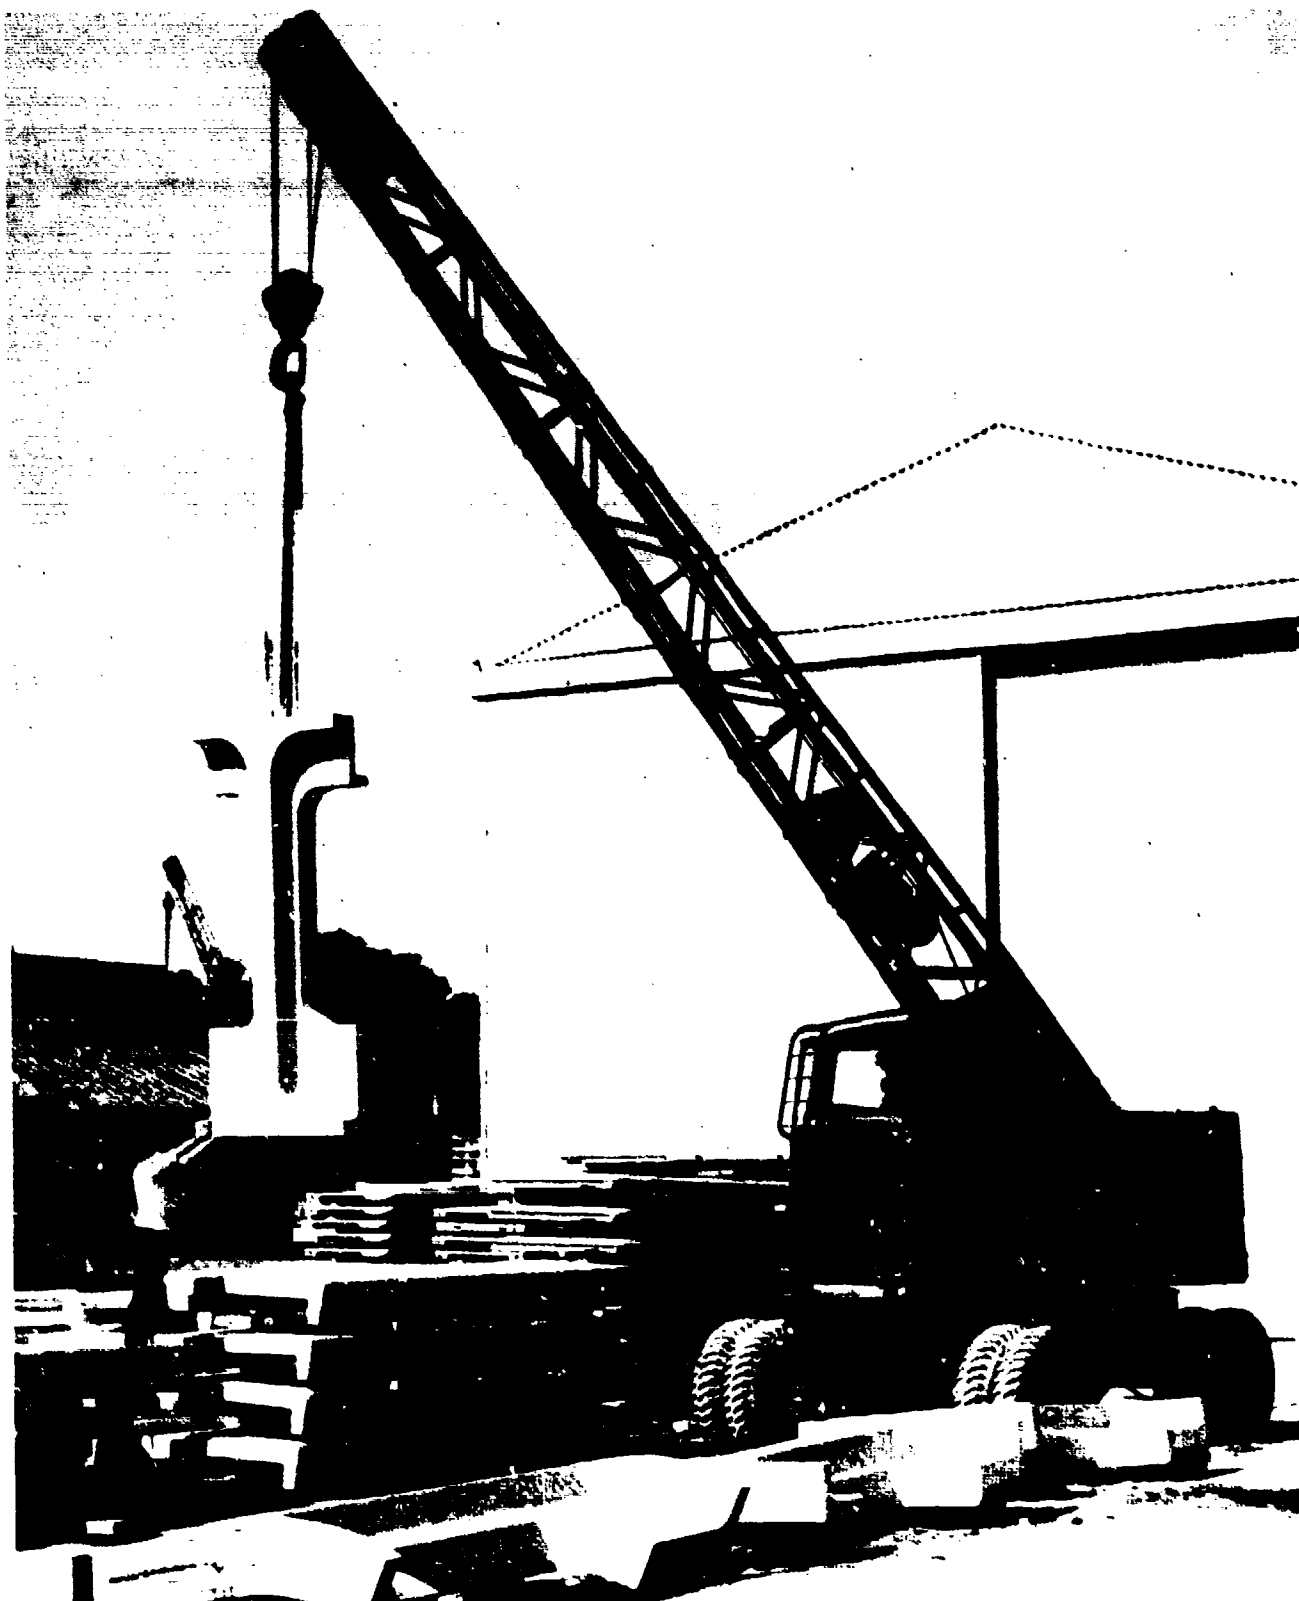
Crane used for handling precast concrete elements (Reprinted from "Precast Concrete Production" by J. G. Richardson)
